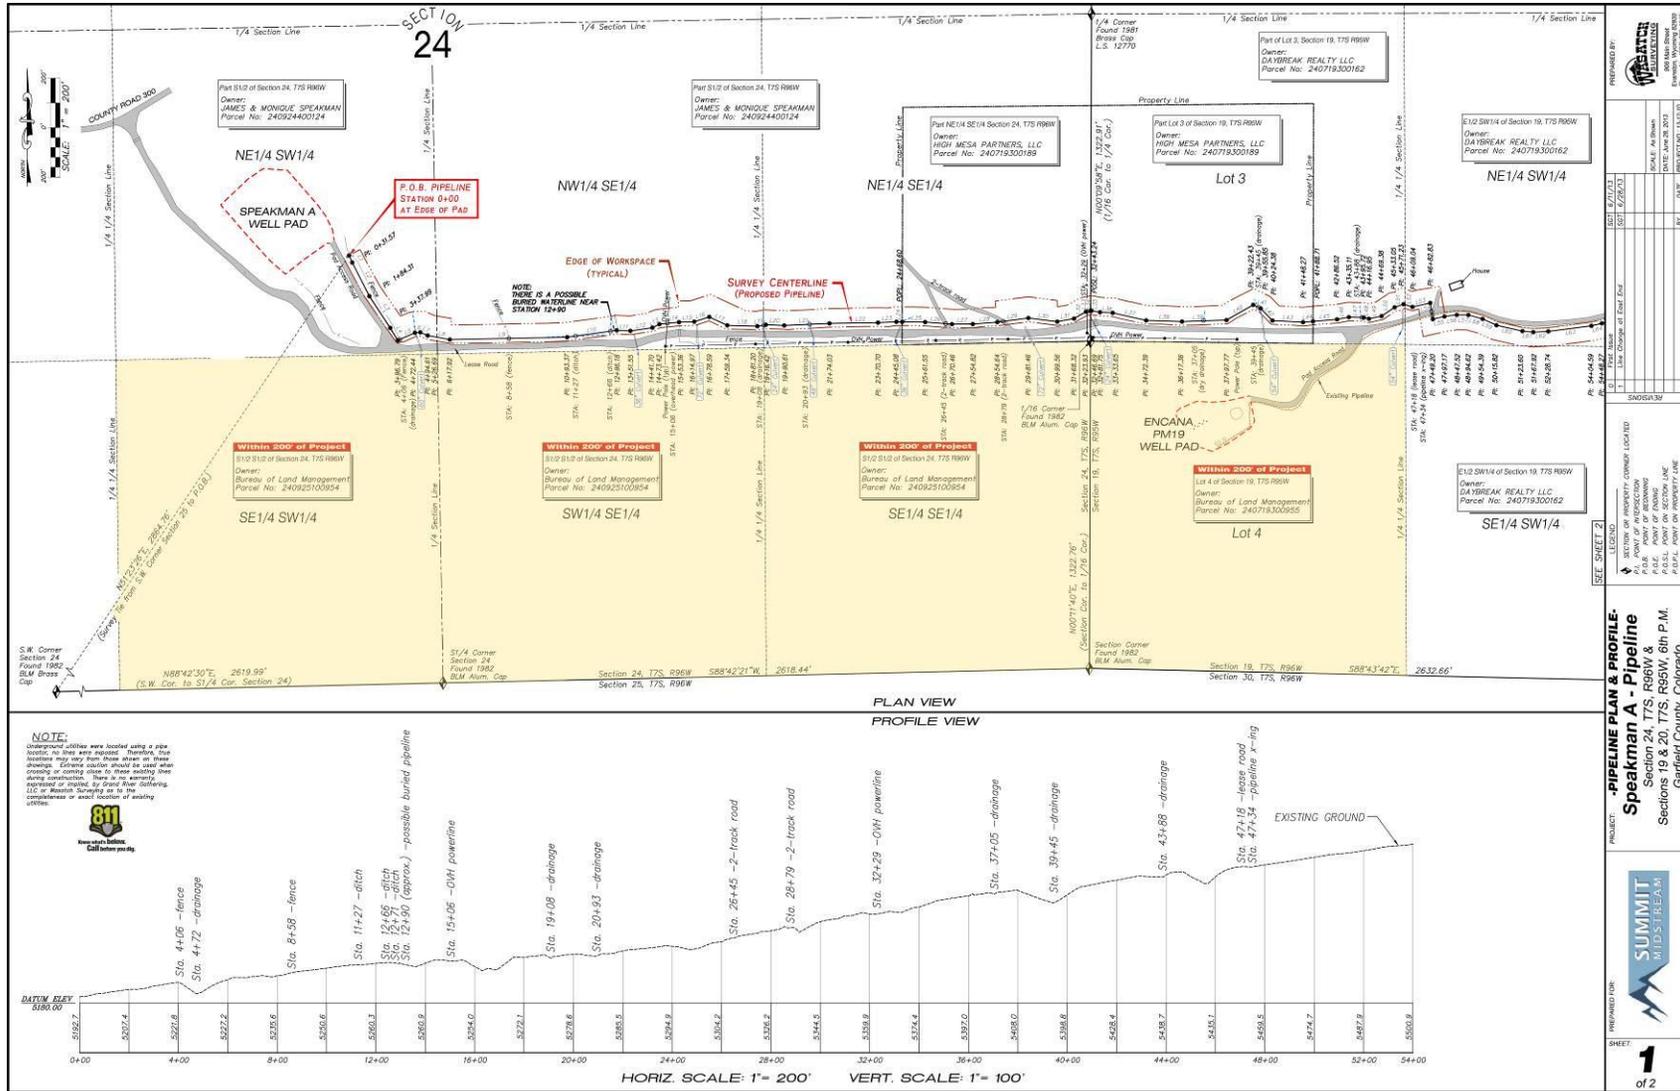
Pipeline Plan and Profile that Parallels BLM (Section 24 and Section 19)
